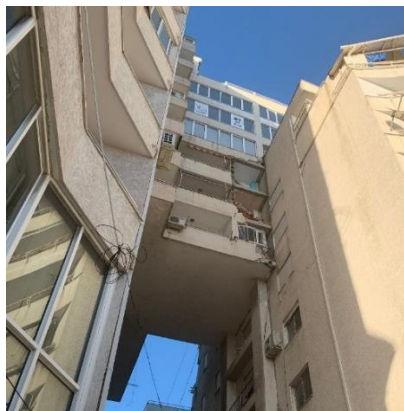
Collapse of the facade walls in the "connecting bridge" area
